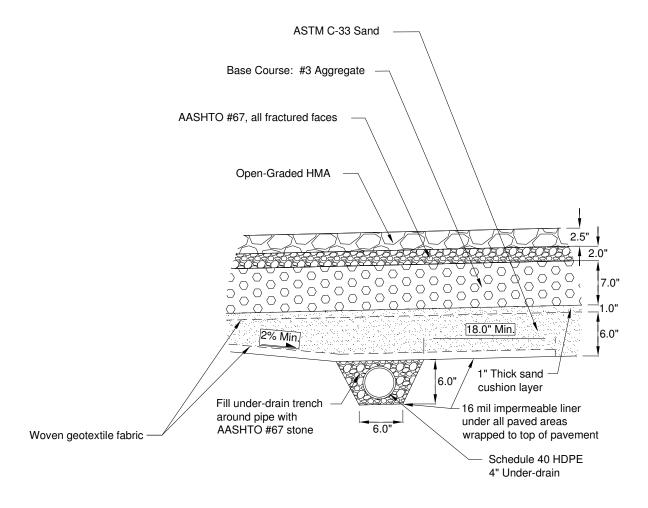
Porous Asphalt (PA) - Typical Cross-Section
